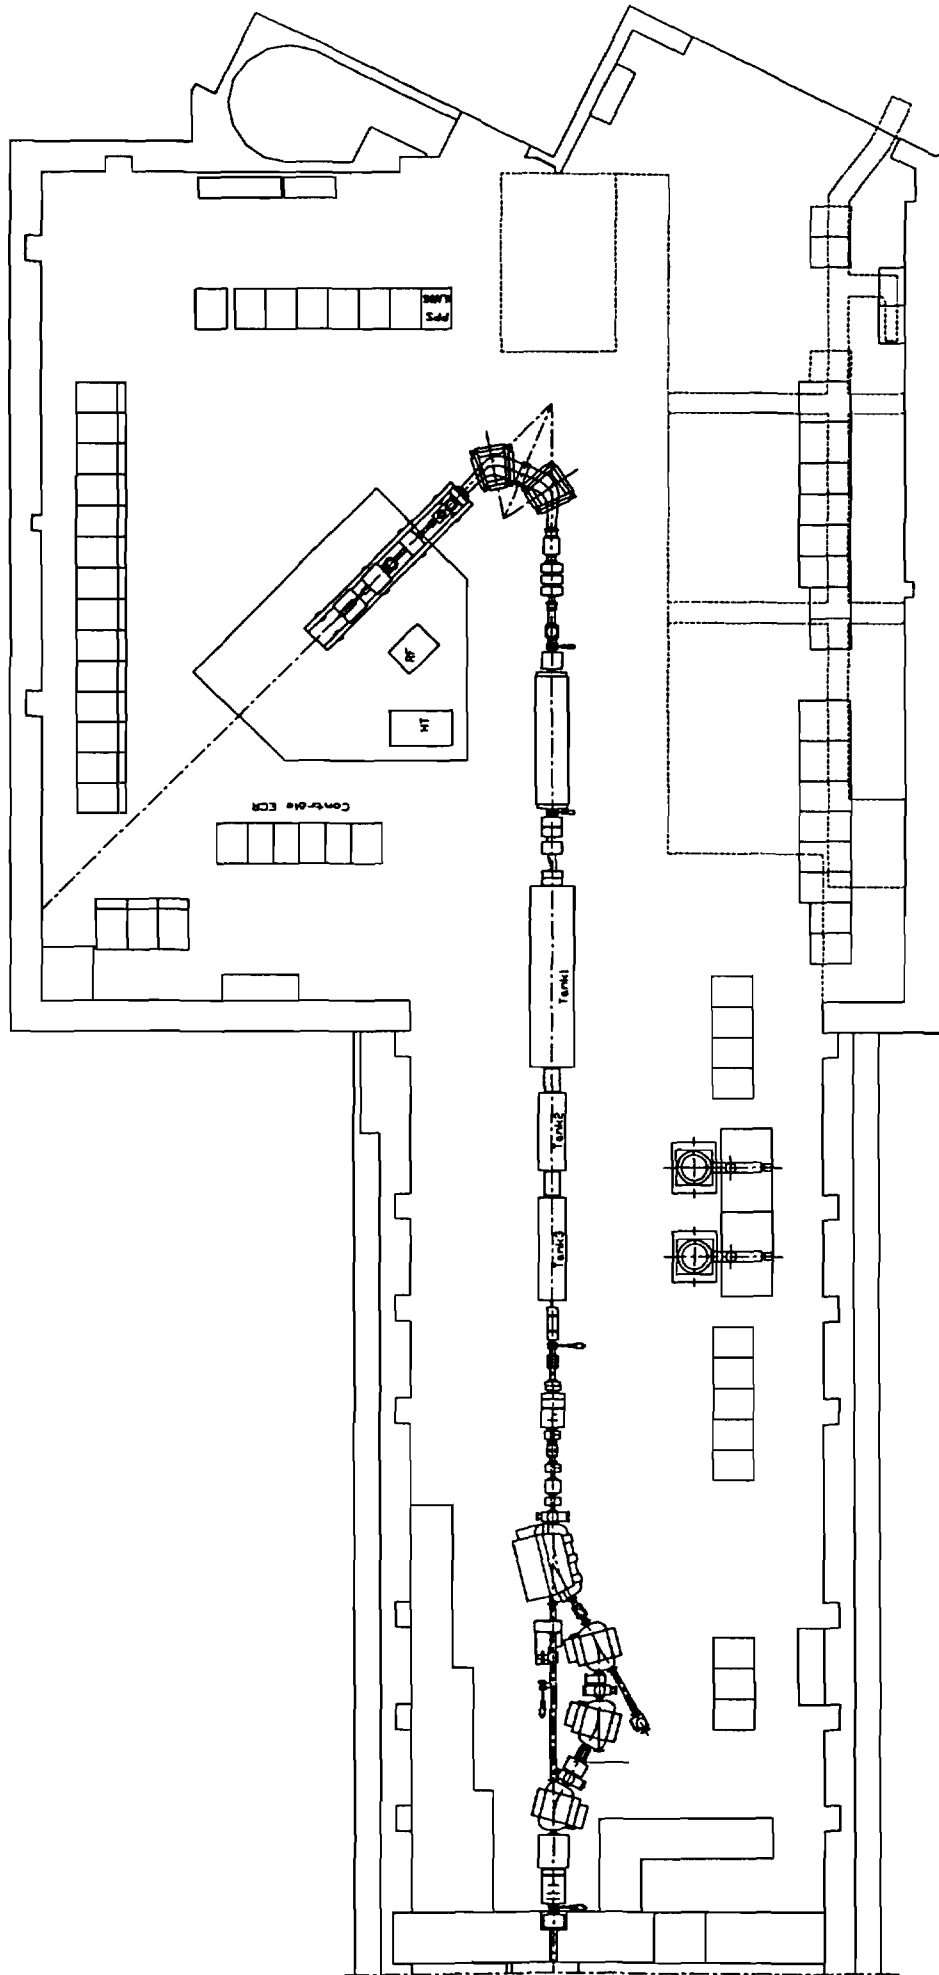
Plan of Building 351 with Linac 3 Layout
